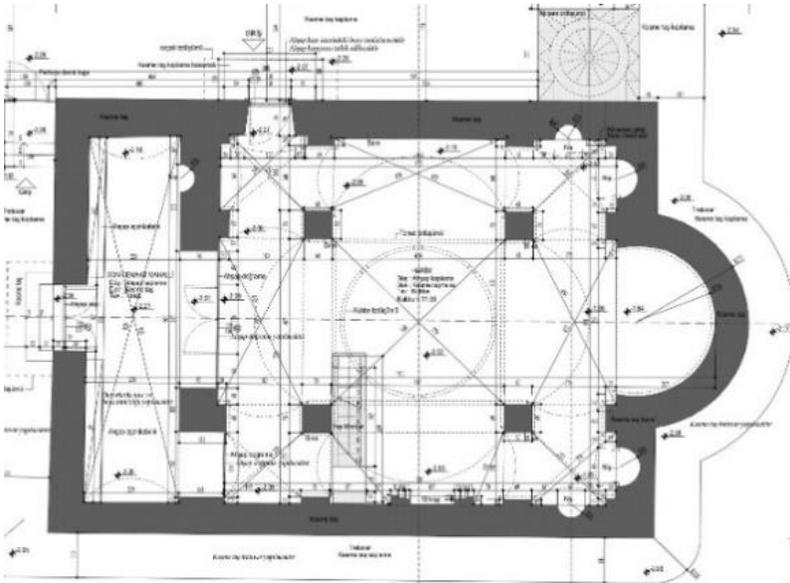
Ground Floor Plan (A Proje Project Report, 2006).
